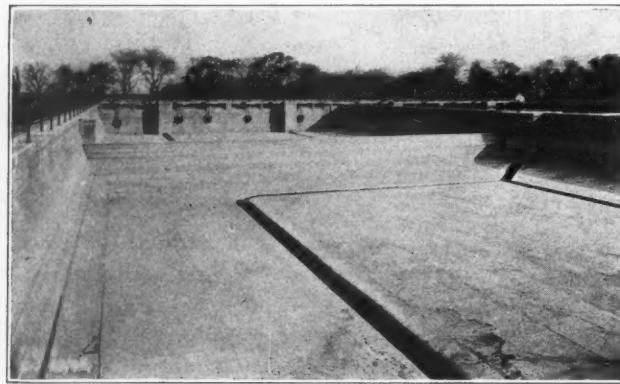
SECONDARY SEPTIC TANK, LOOKING TOWARD COLLECTING AND DISTRIBUTING WALL
